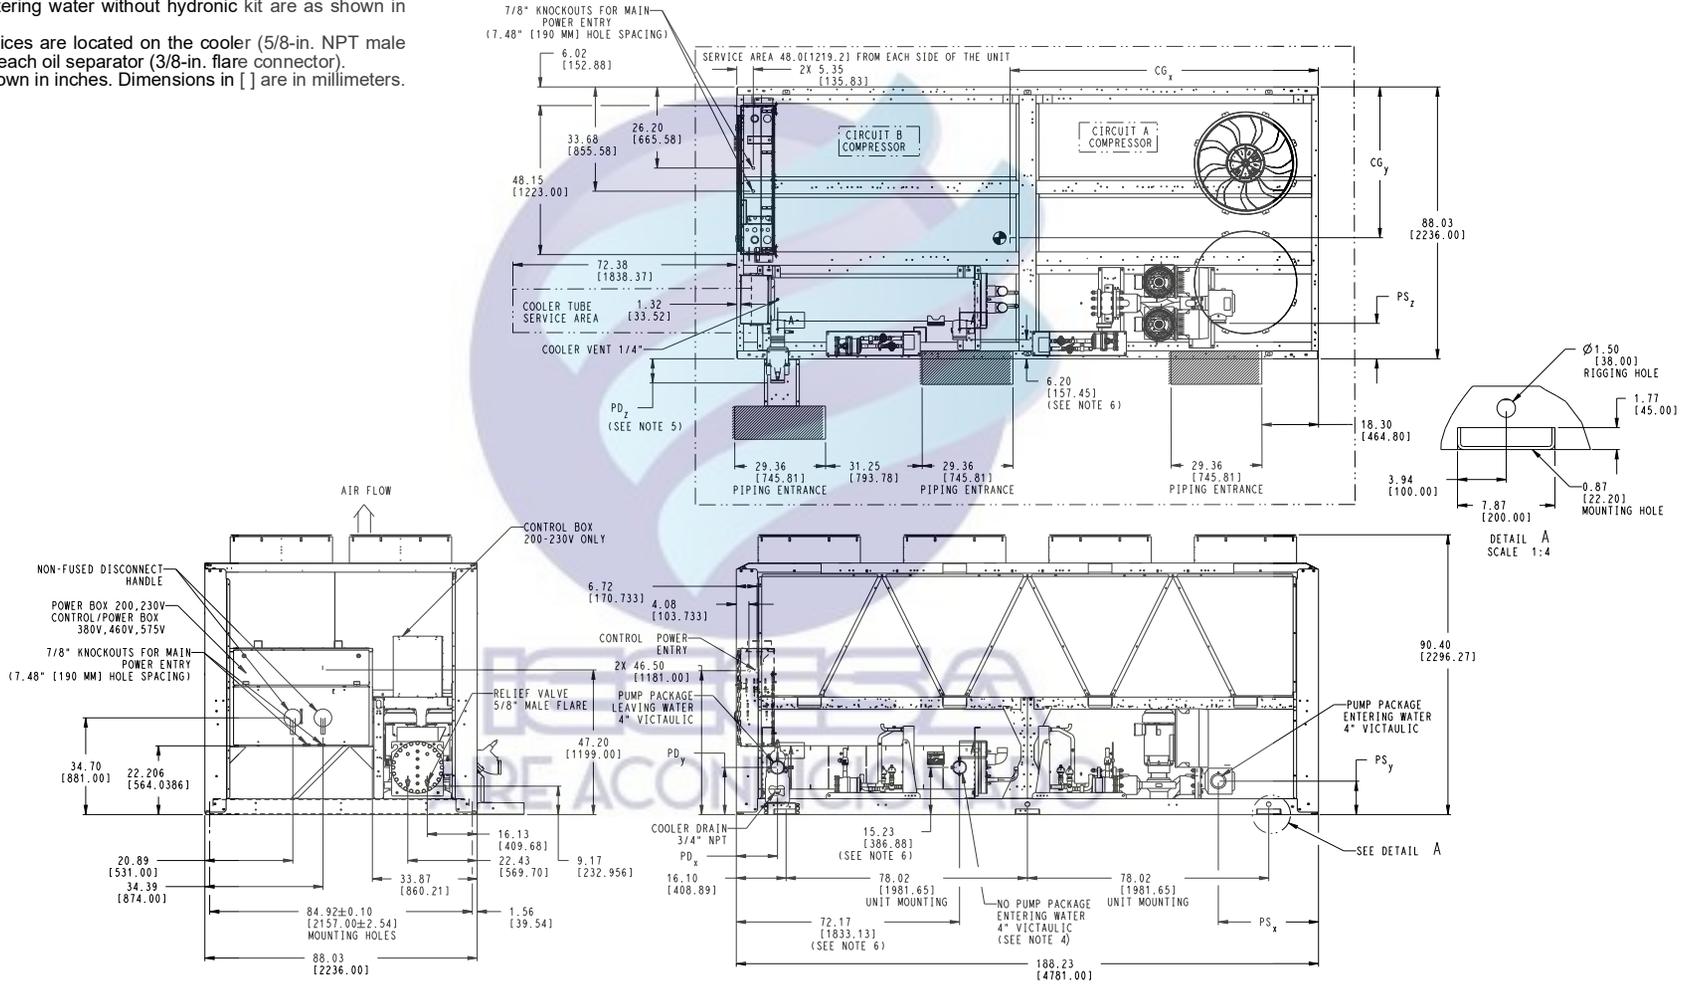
30XA092, 102 Air-Cooled Liquid Chiller Dimensions
